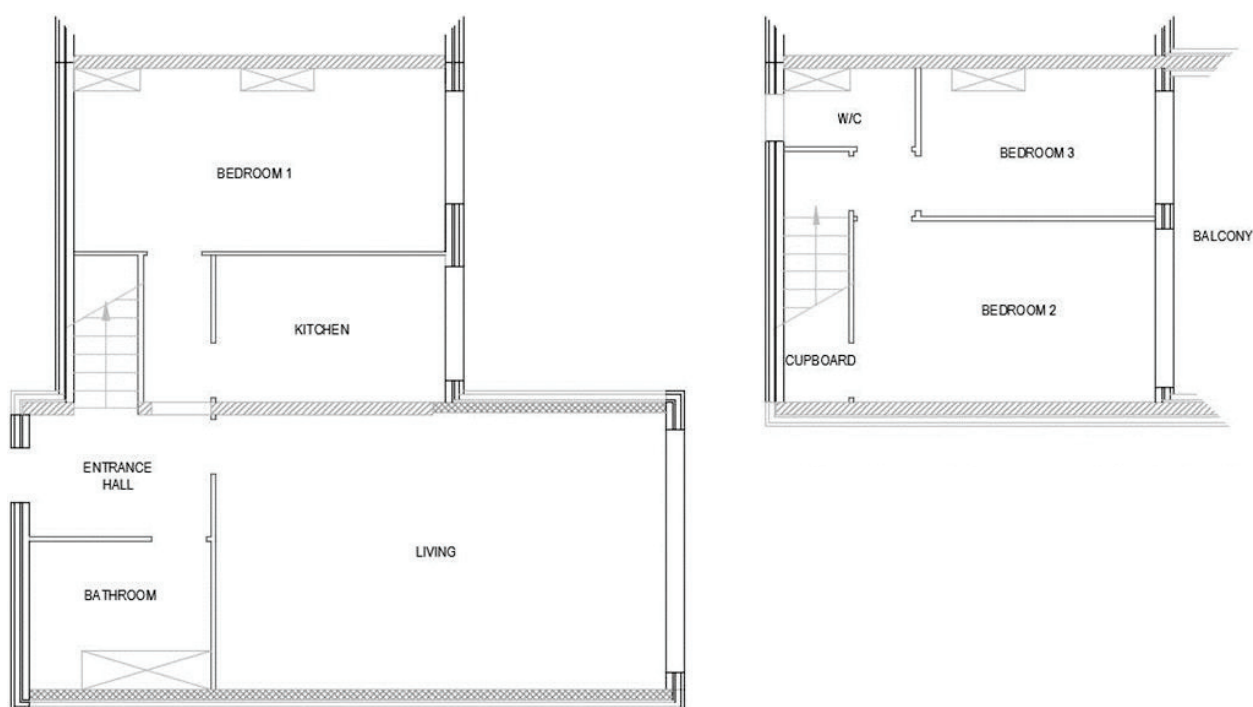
Example floor plans in 6-storey ziggurat block (Flat 119 Tangmere)
